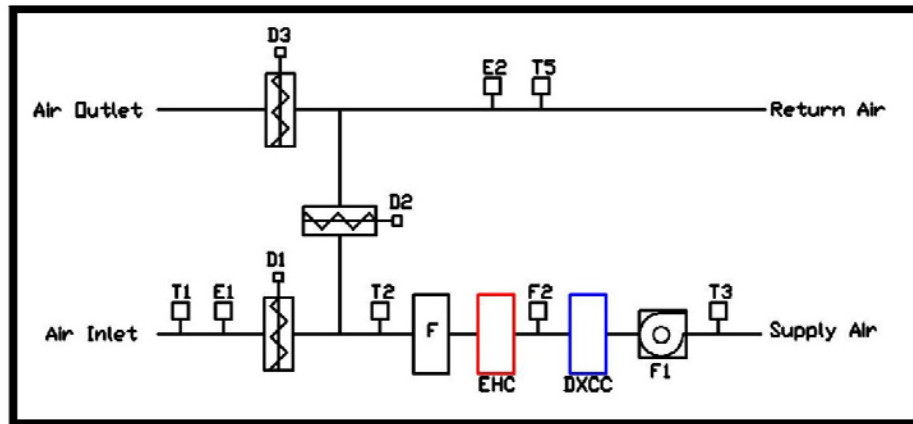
Schematic of a Typical Retail Rooftop Air Handling Unit
